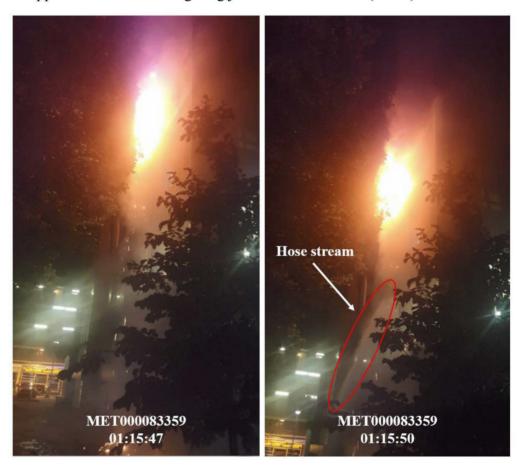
First observed firefighting hose stream on East elevation of building envelope at 01:15 on 14 June 2017 (MET000083359)
